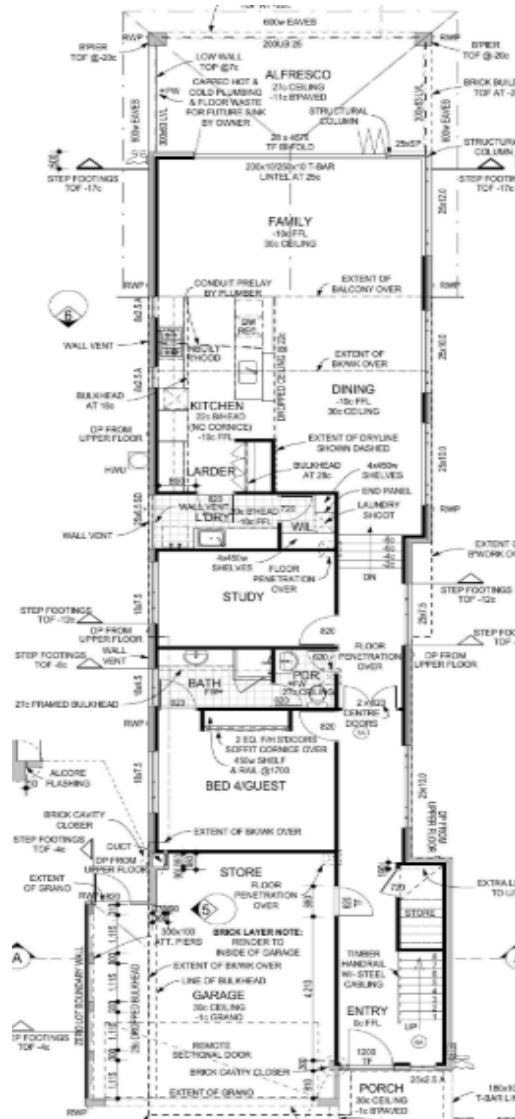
Ground Floor Plan of 6B Cowrie Crescent
